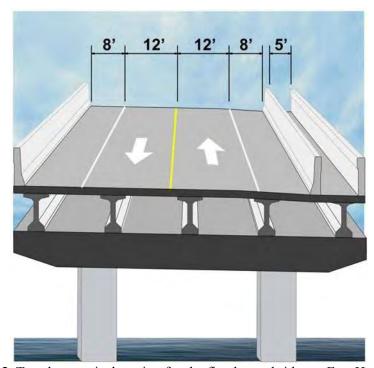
Two-lane typical section for Fort Hamer Road.
